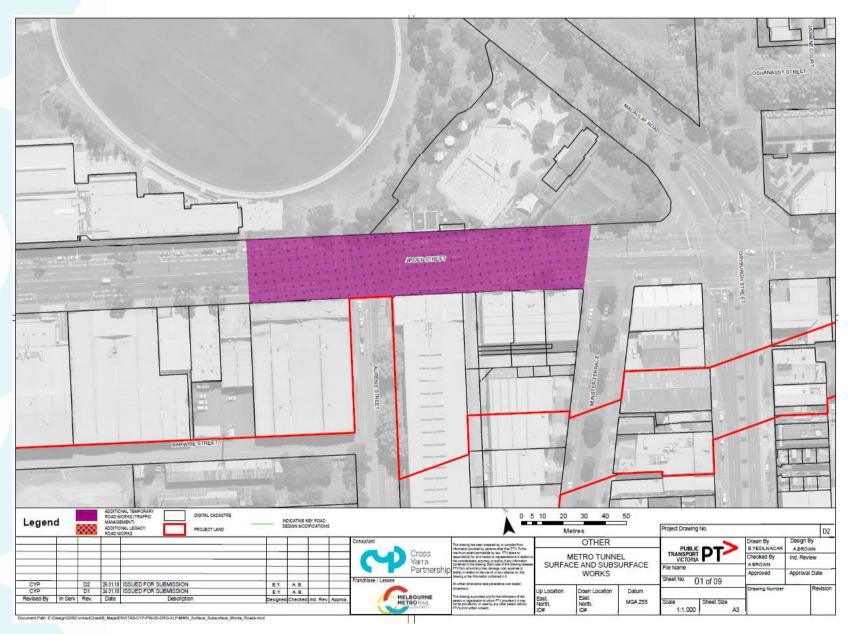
ARDEN STREET ADDITIONAL ROAD SURFACE WORKS
